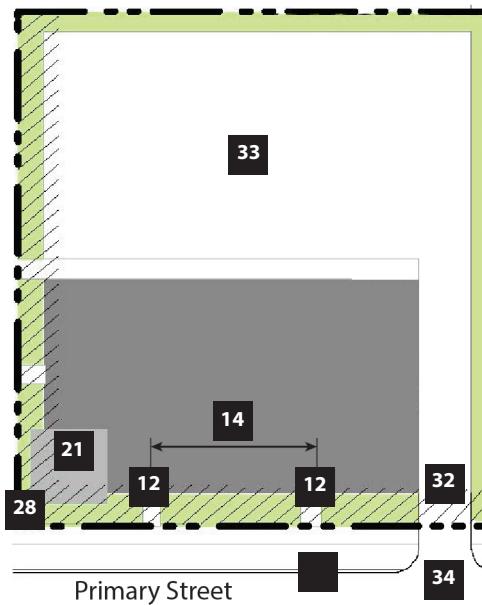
General building siting diagram shown with corner tower and rear vehicular access. Not to scale.
